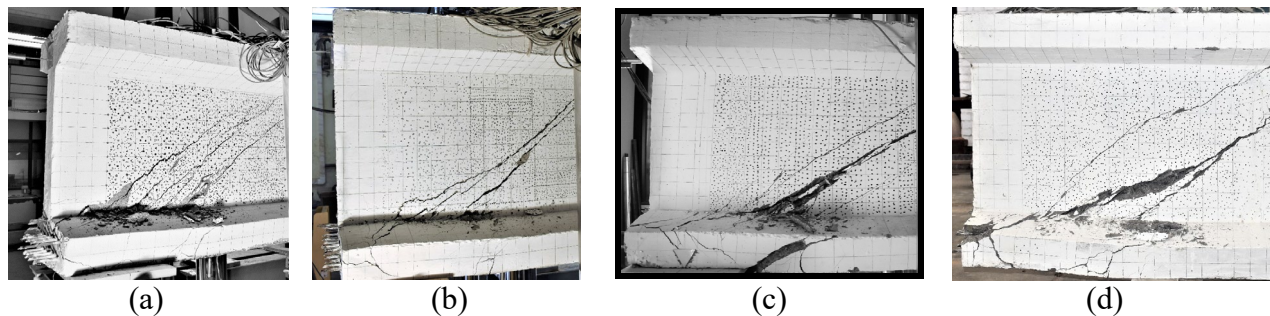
Cracks and failure patterns: fully bonded girder (a) end A; (b) end B; 25% debonded girder (c) end A; (d) end B
